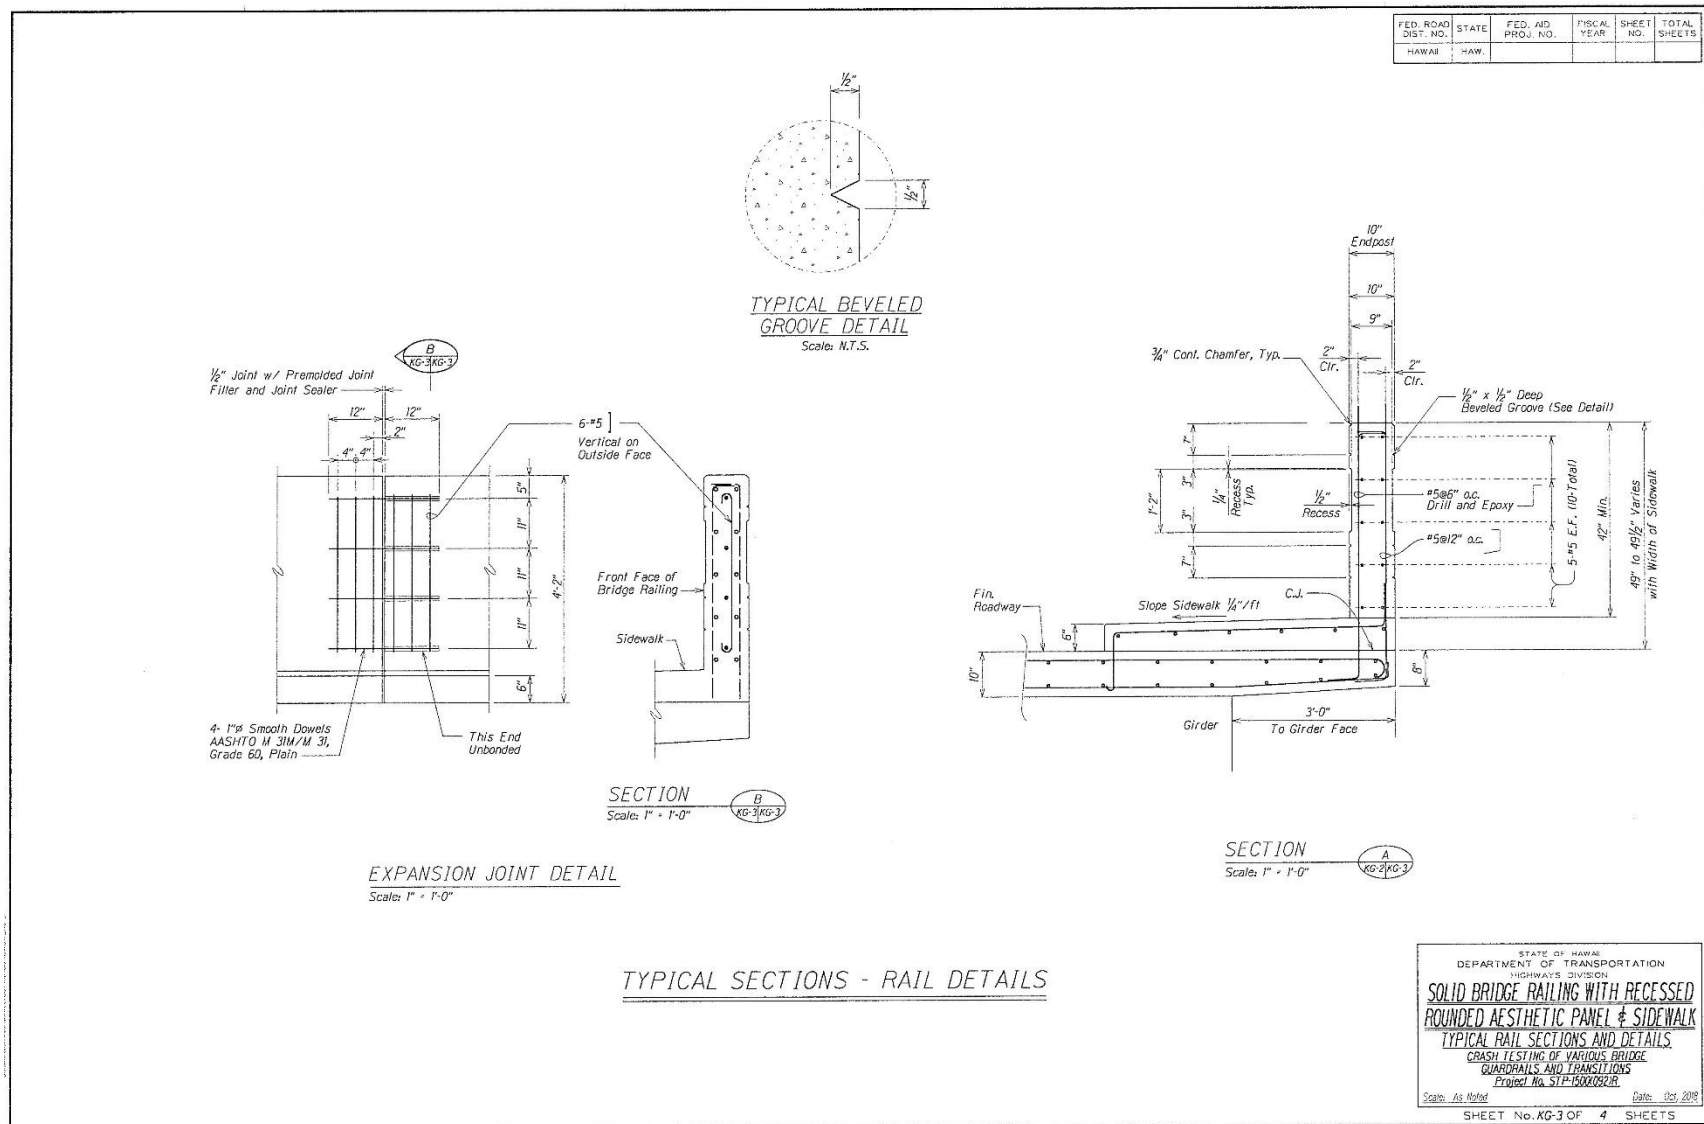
HDOT Standard Detail for 42-in. Tall, Aesthetic Concrete Bridge Rail [1]
